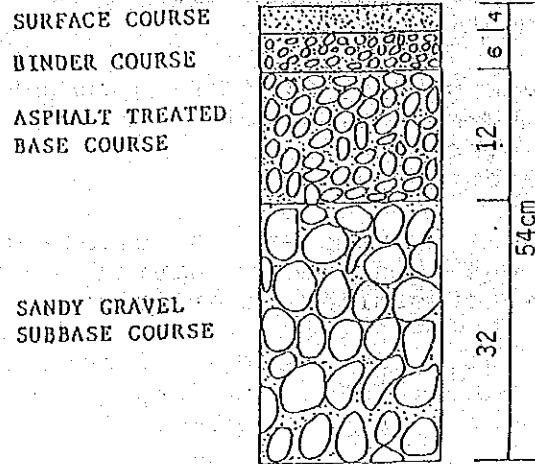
Flexible Pavement Structure for Design Road Segment of North Klang Straits Bypass-South Klang Straits Bypass, New Klang Valley Expressway-Shah Alam Highway and Shah Alam Highway-Kuala Lumpur Seremban Expressway
